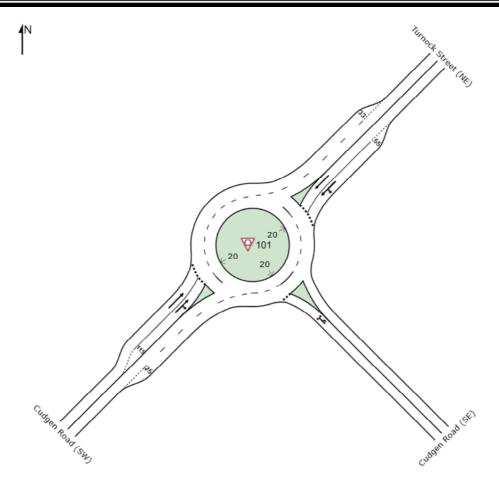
Cudgen Road / Turnock Street SIDRA Intersection Layout
